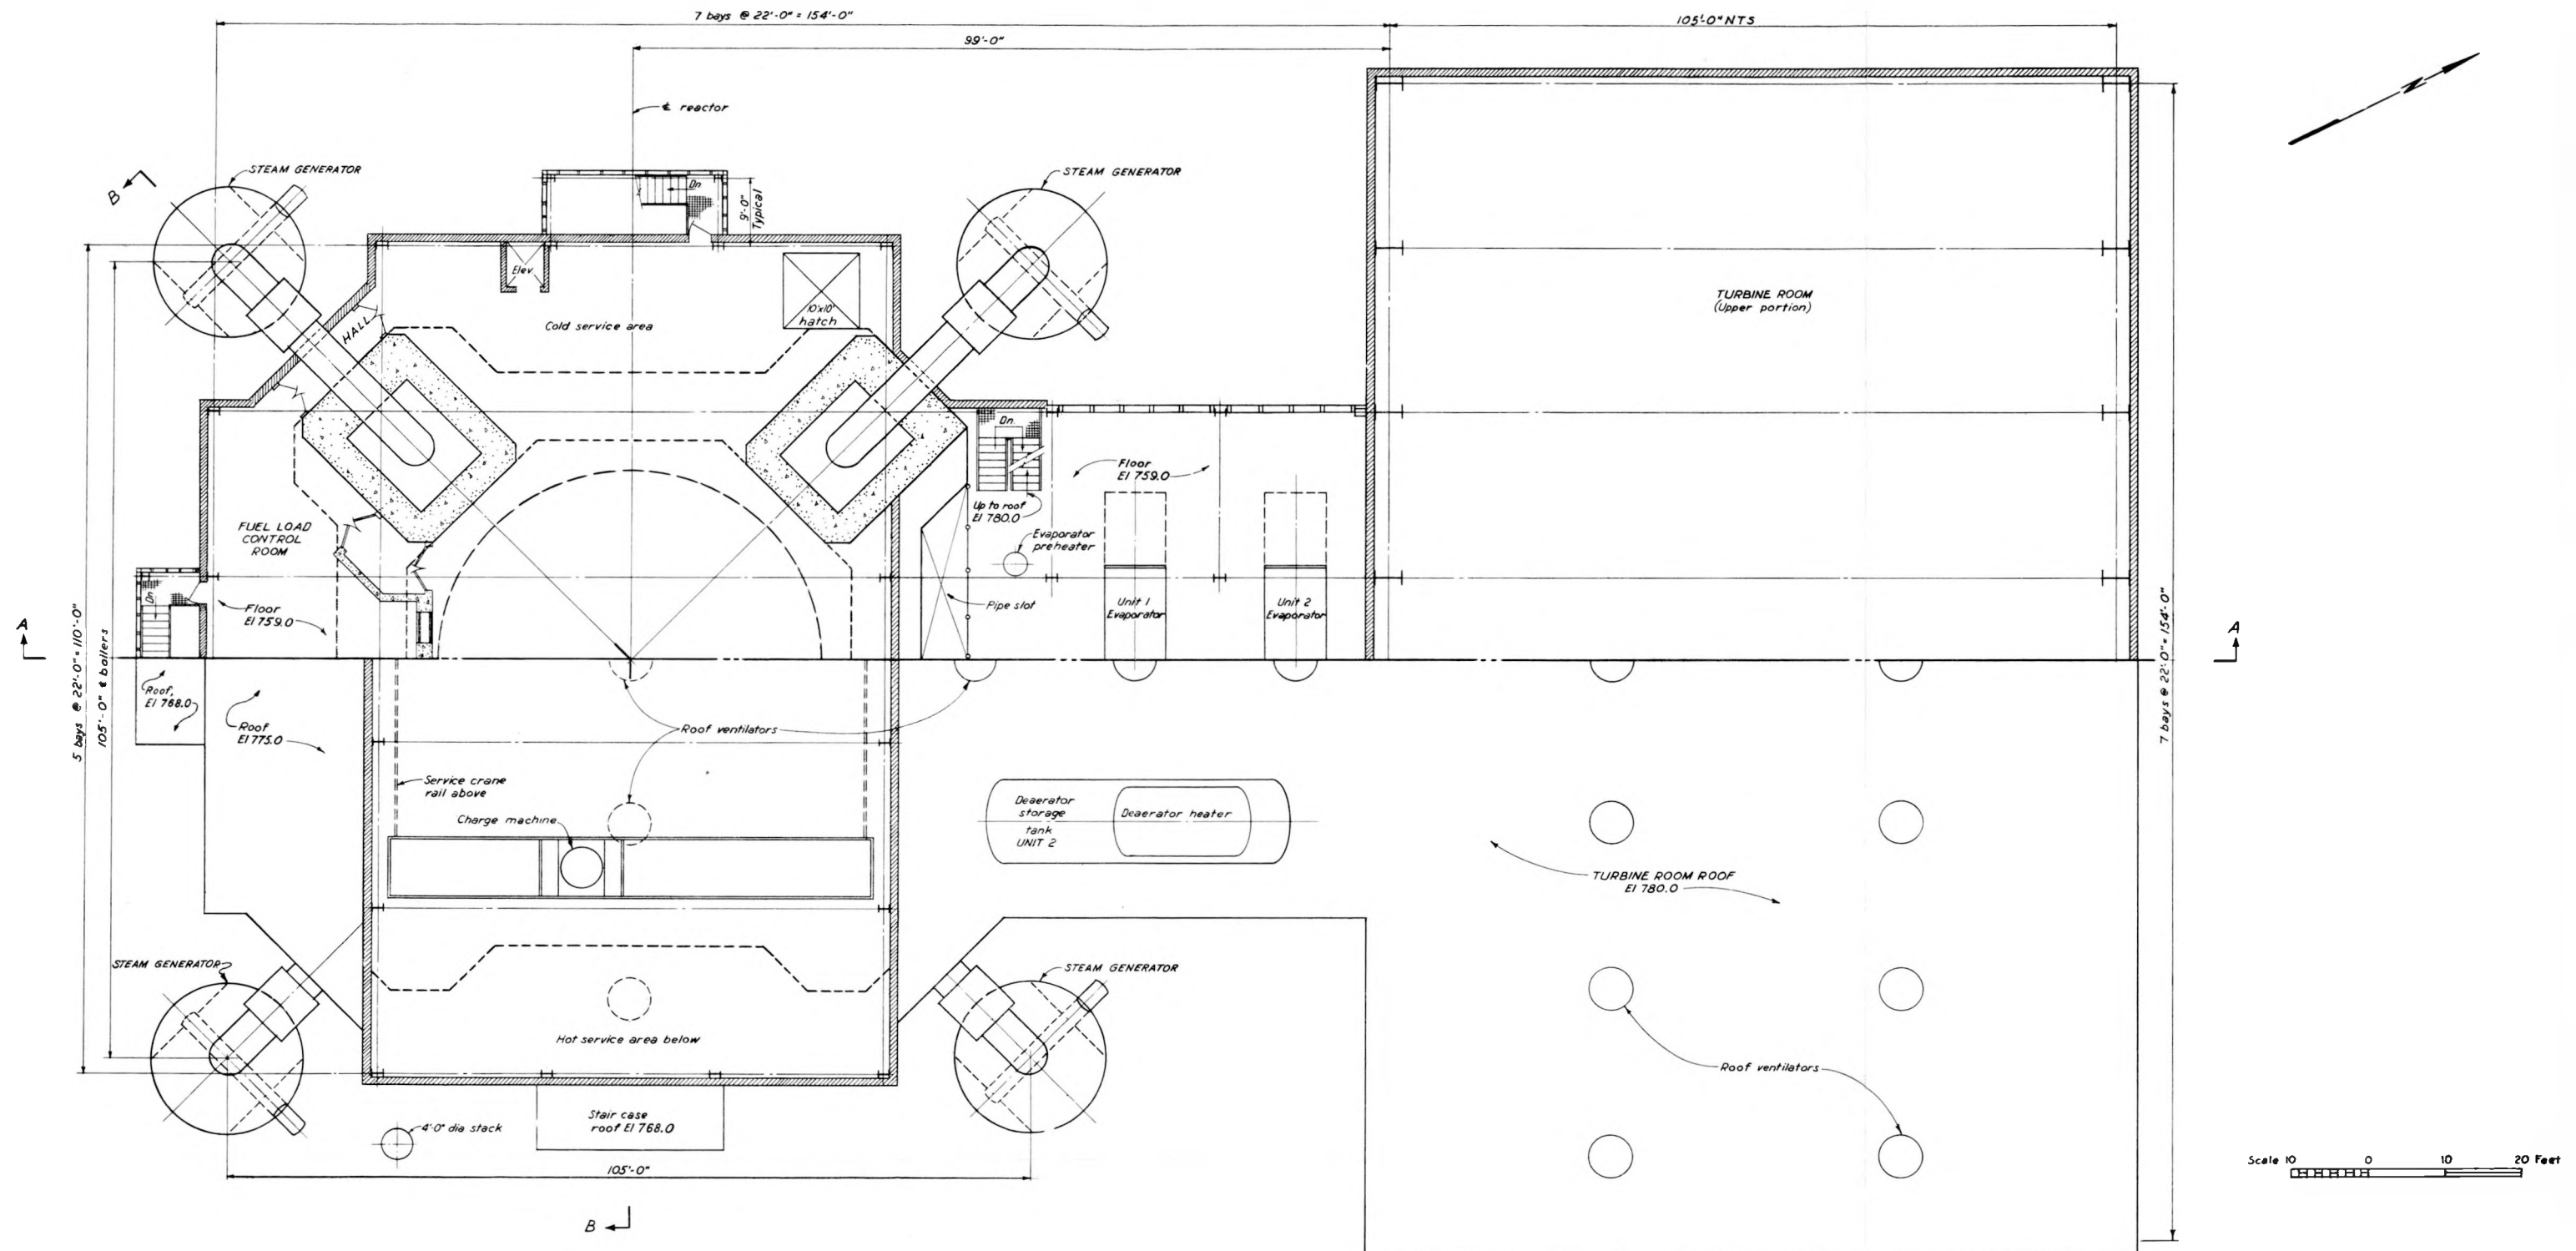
Equipment Layout at Elevations 759.0 and 780.0 (ORNL - GCR-2) (Design Div., Tennessee Valley Authority).
